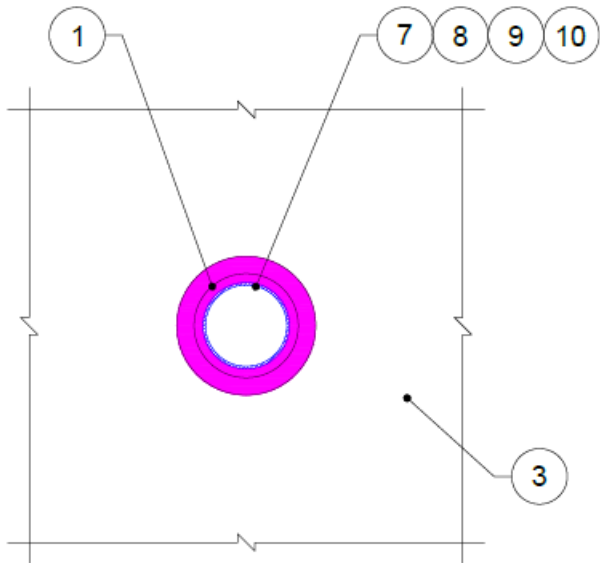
HB Fuller FIRESOUND Sealant System with Metal Pipes in Floor
